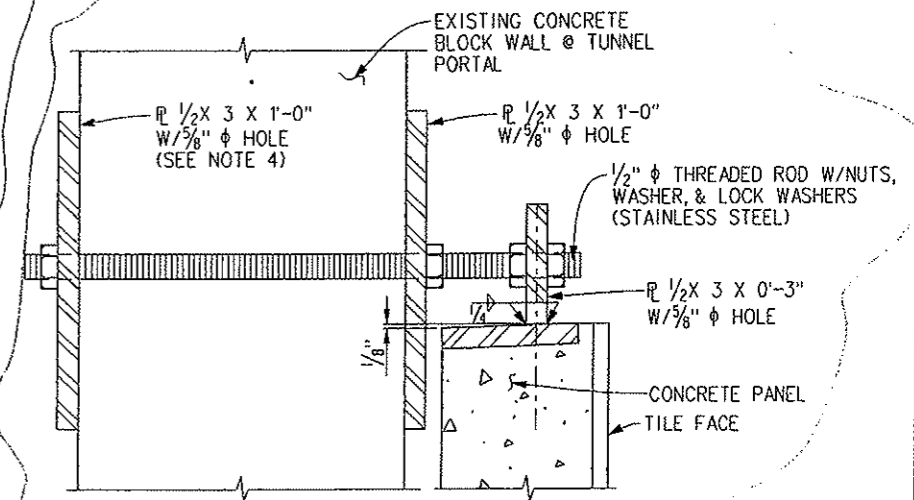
DETAIL AT TOP CONNECTION (NORTH TUNNEL)
